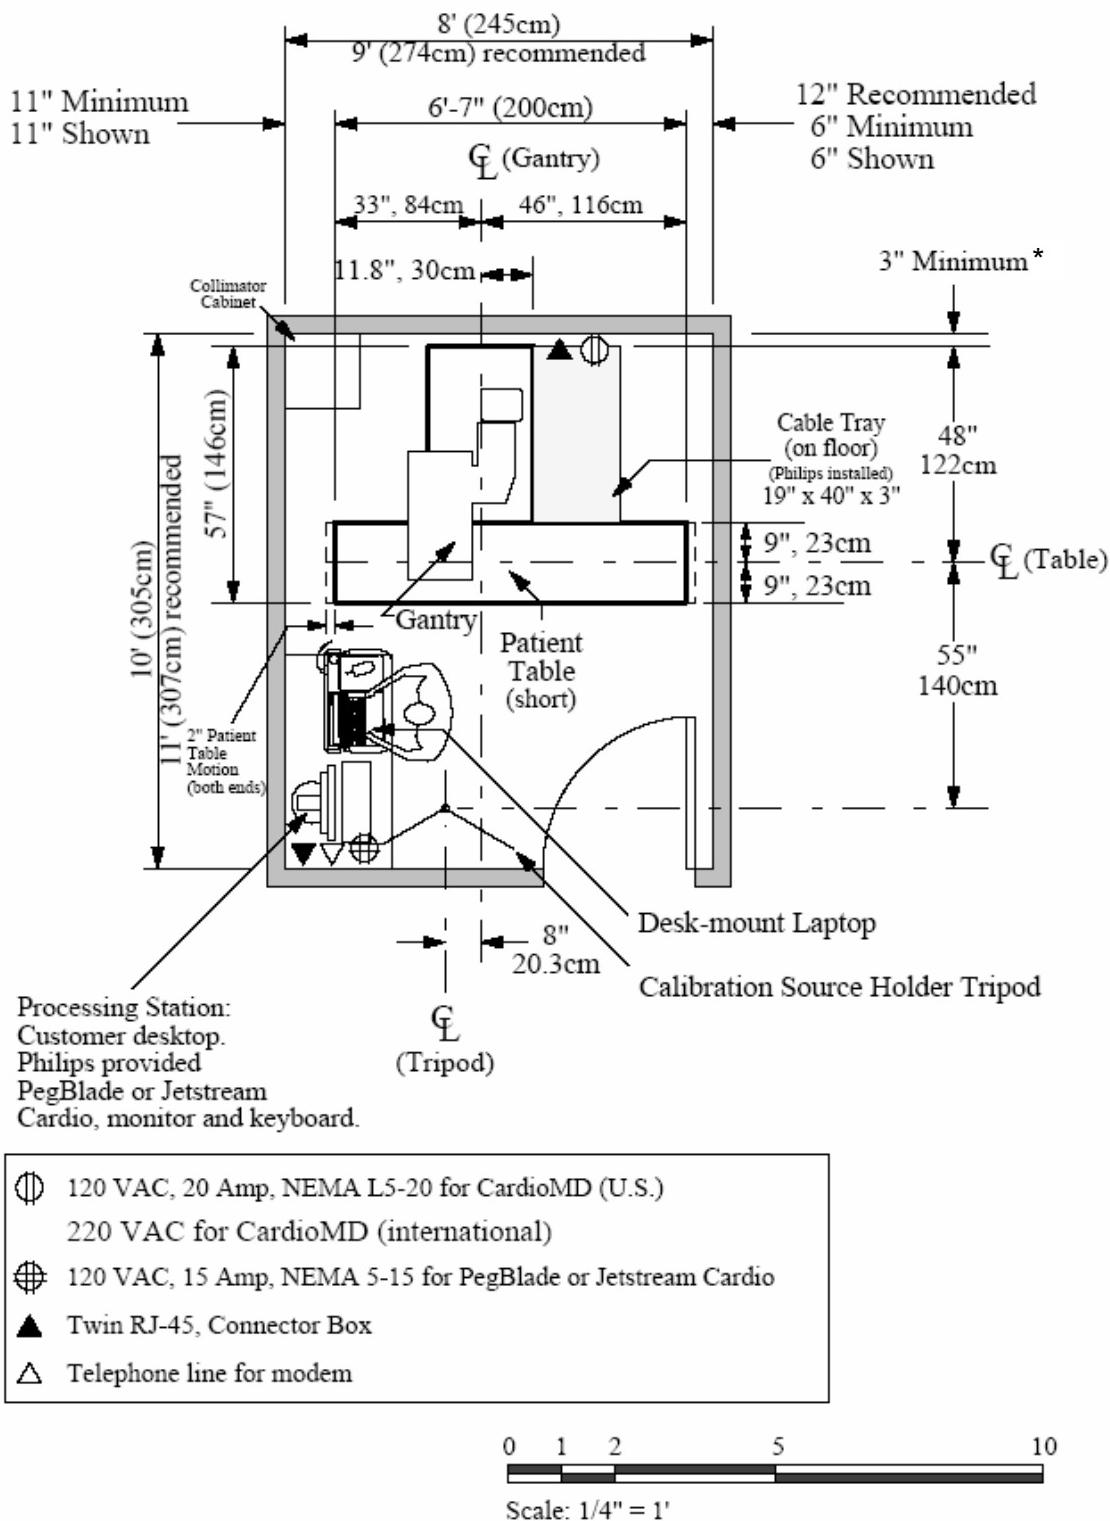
Minimum room layout with short table and cart-mounted acquisition PC
